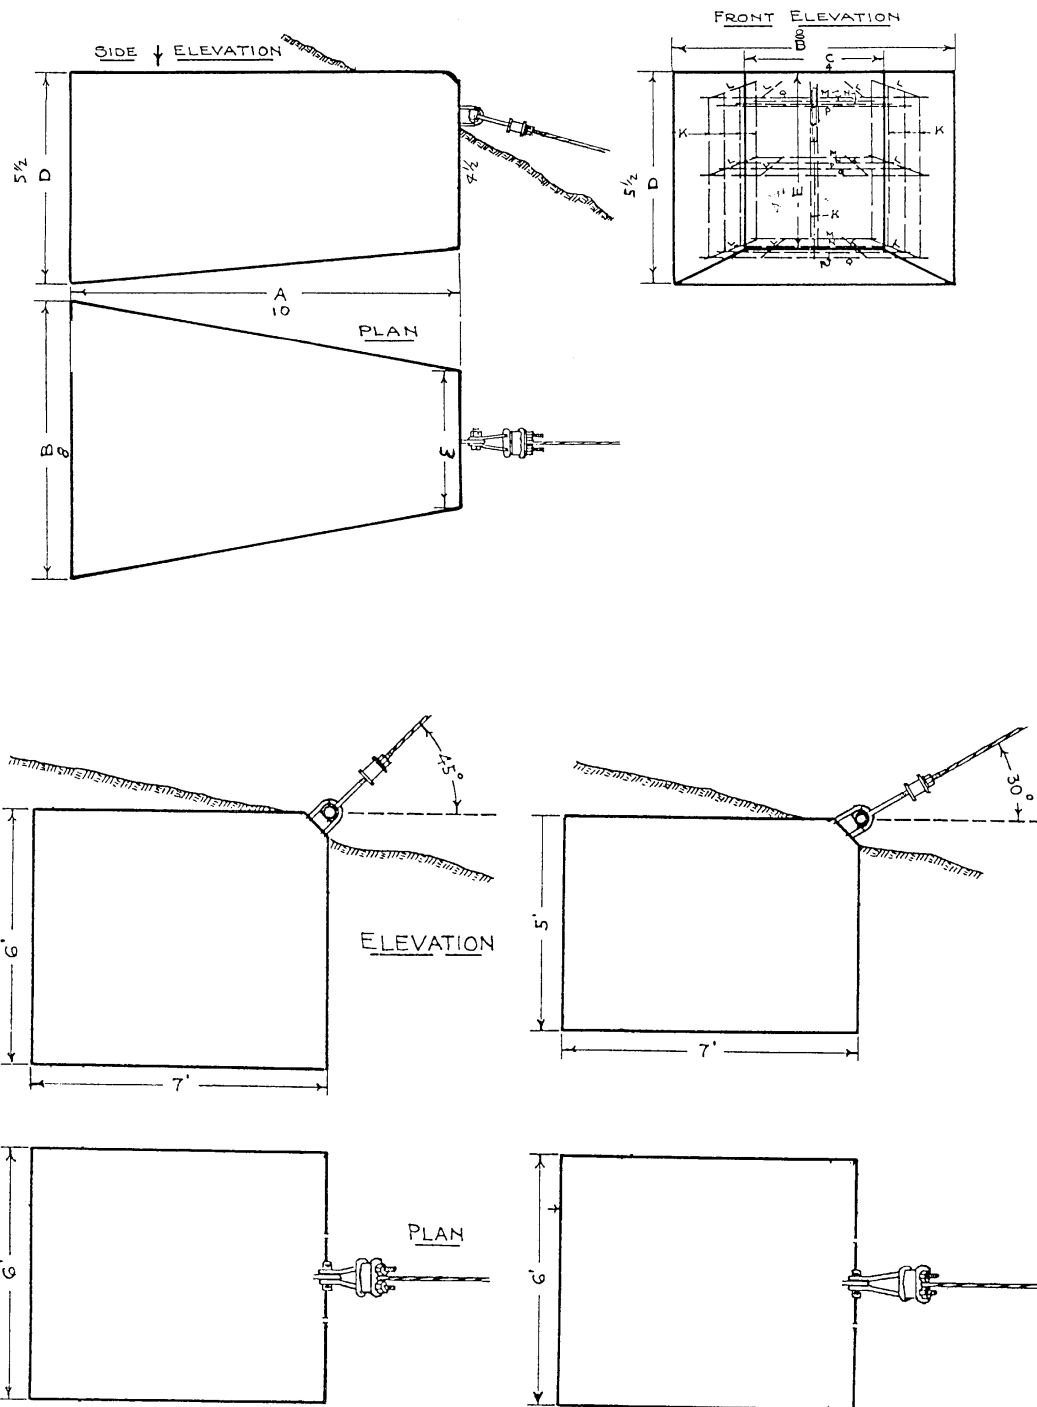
Cableway anchors. Type used will depend upon bank slope.
